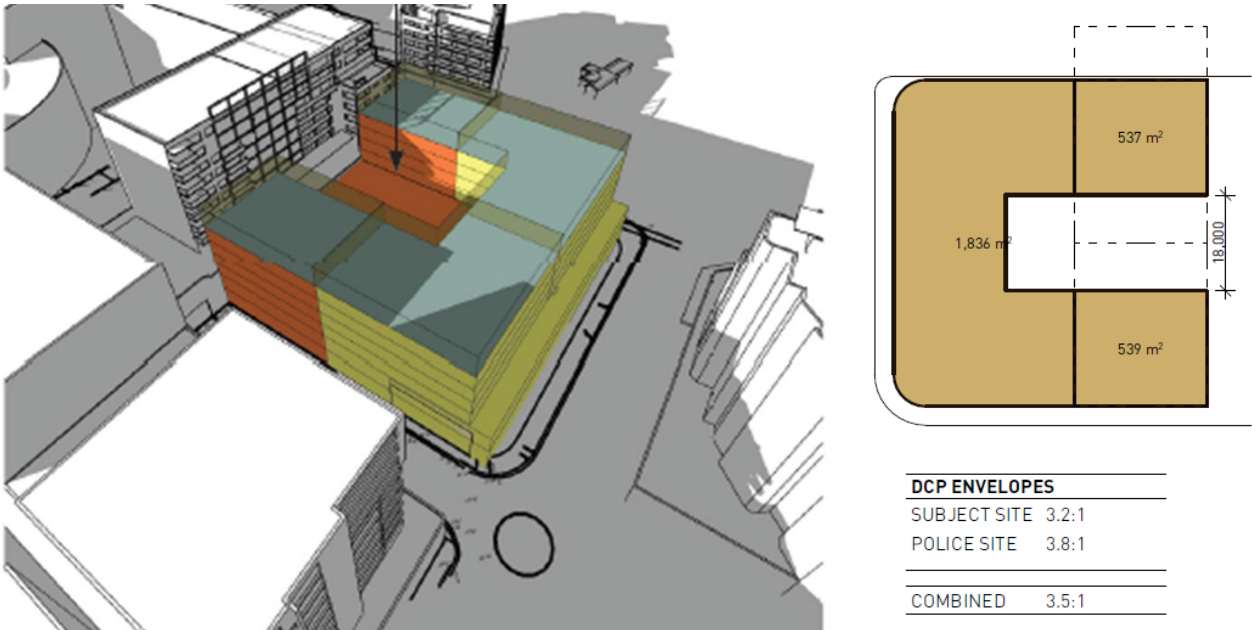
DCP Envelope massing across proposed Site (orange) and Police Site (yellow)
